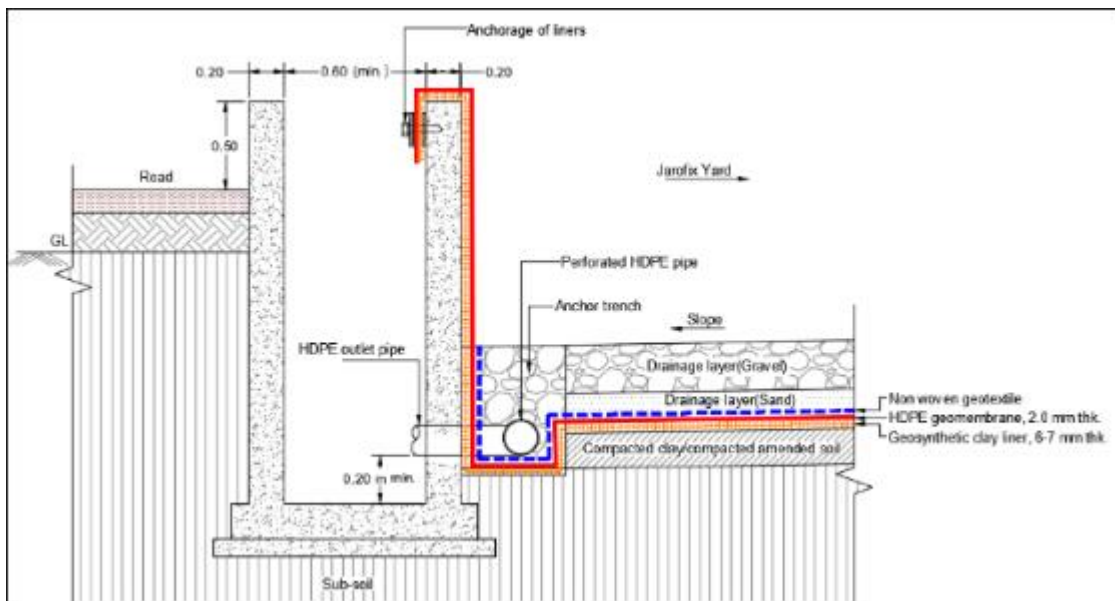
Typical cross section of liner anchoring system for Jarosite yard
